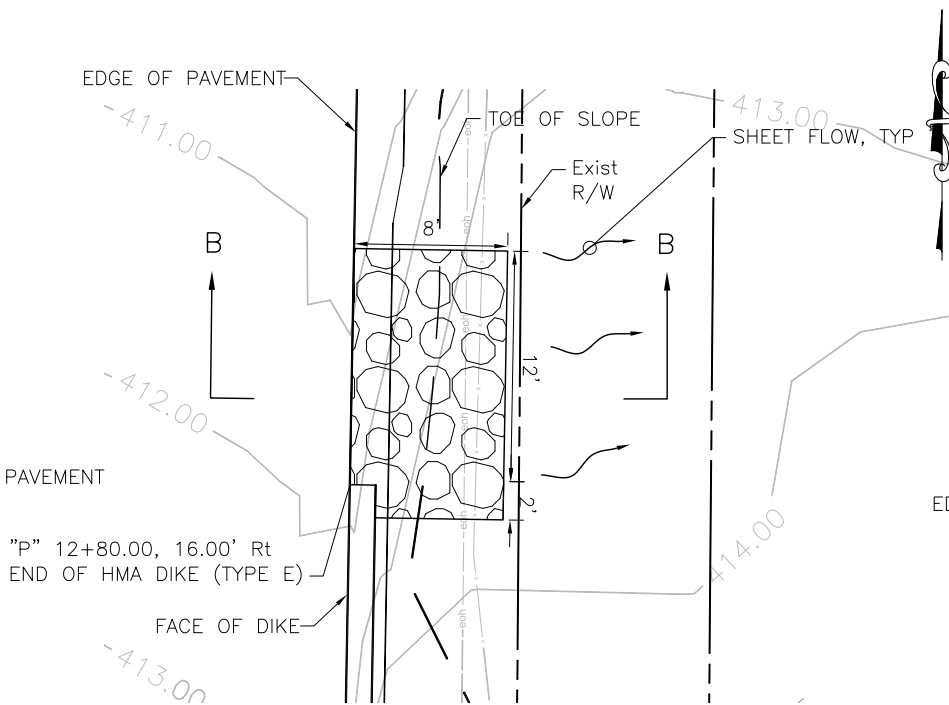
ABUTMENT ROCK SLOPE PROTECTION
